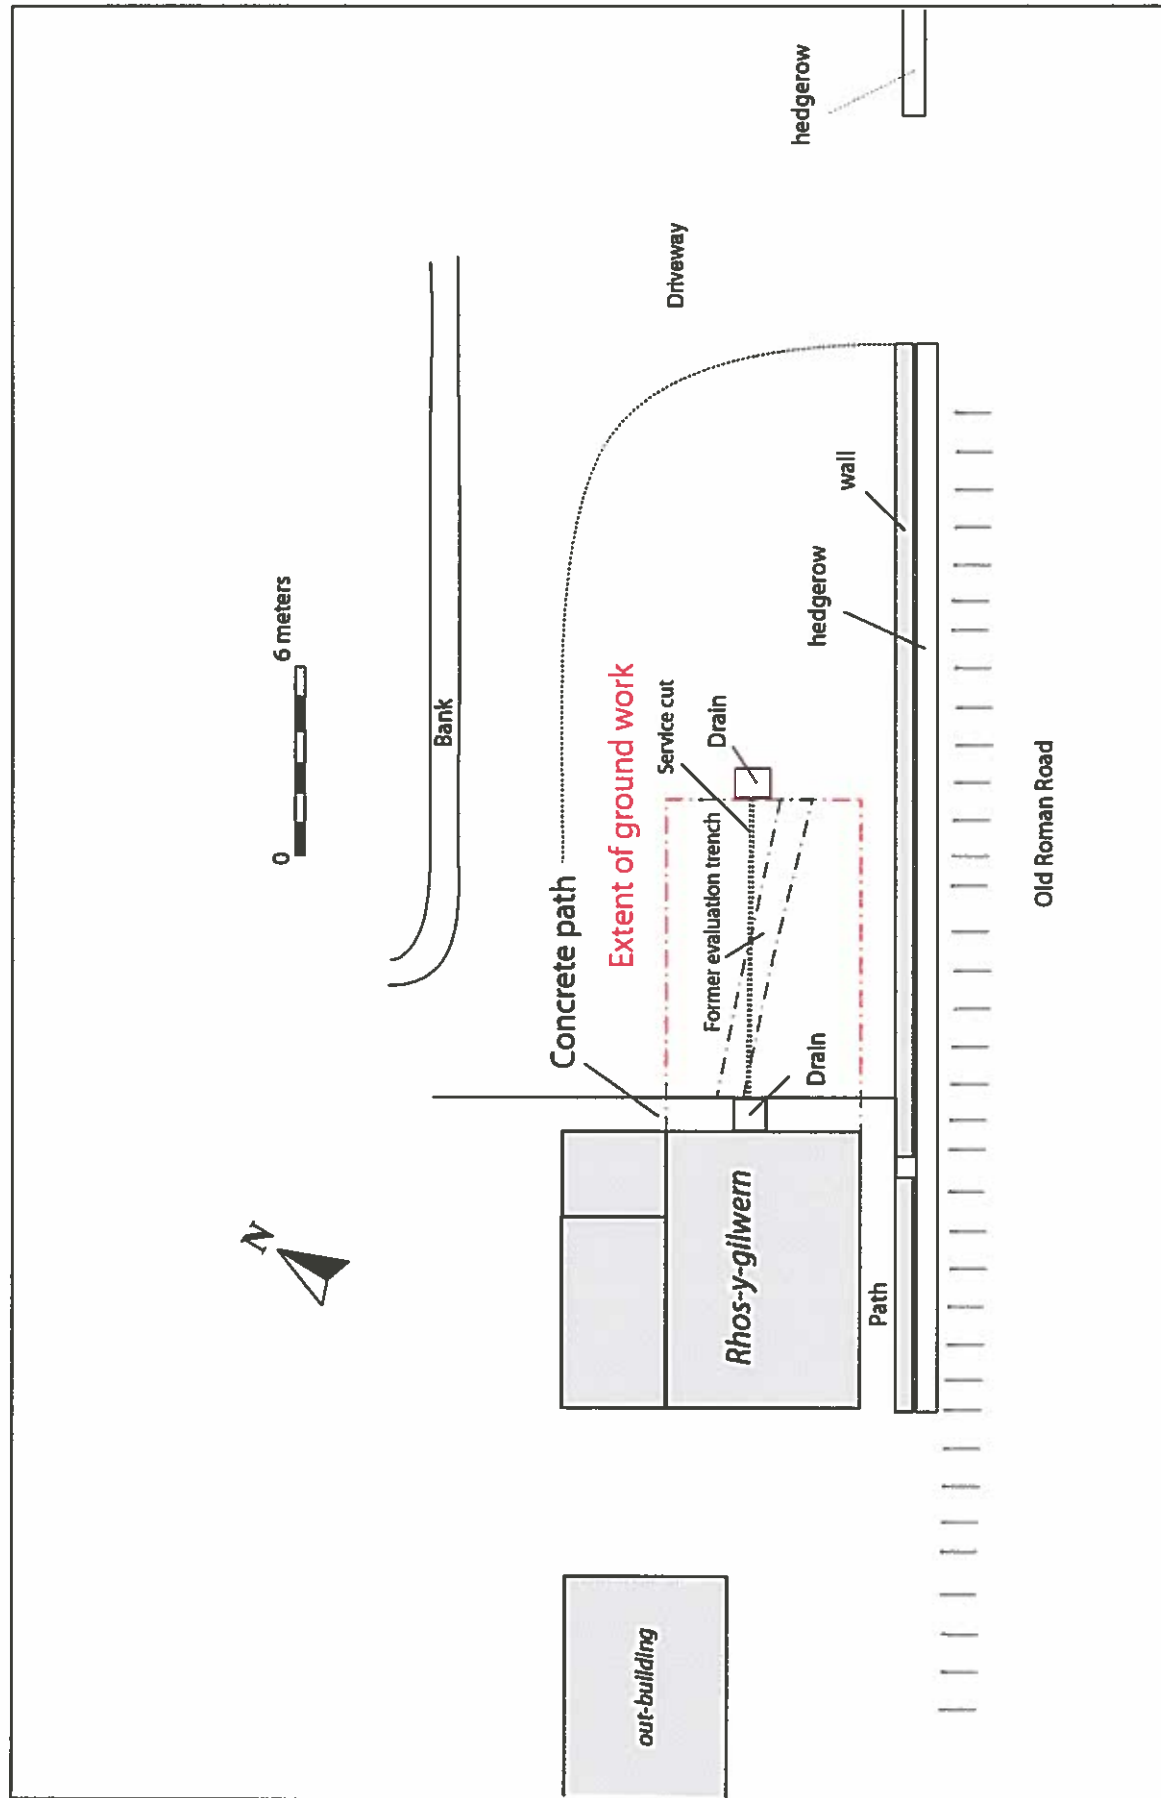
Ground plan showing extent of ground work for east extension of Rhos-y-Gilwen.
